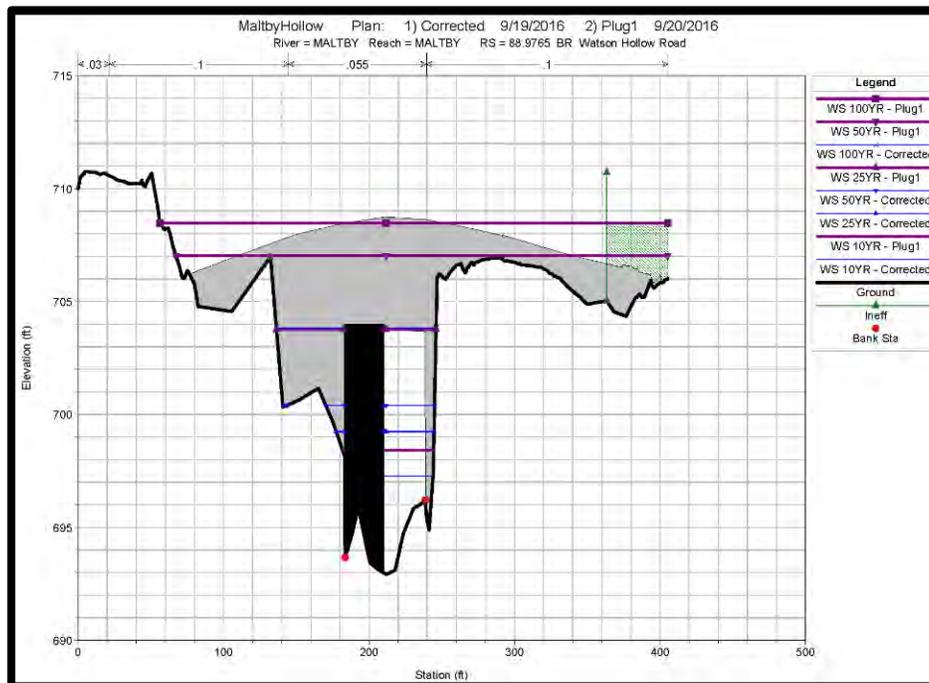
Section View of Plugged Conditions at Maltby Hollow Bridge
